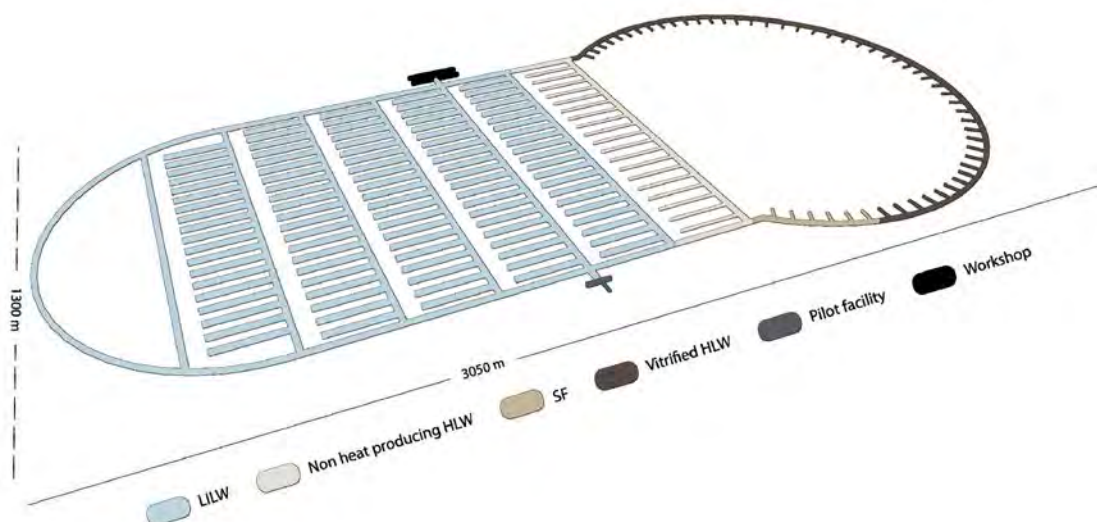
Artist impression of the disposal sections of the underground facility.
